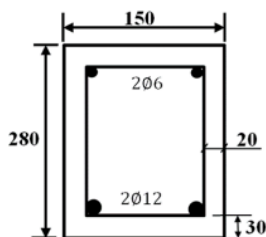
cross section of control beam (M. Abdallah [7]) (All dimensions are in mm)
